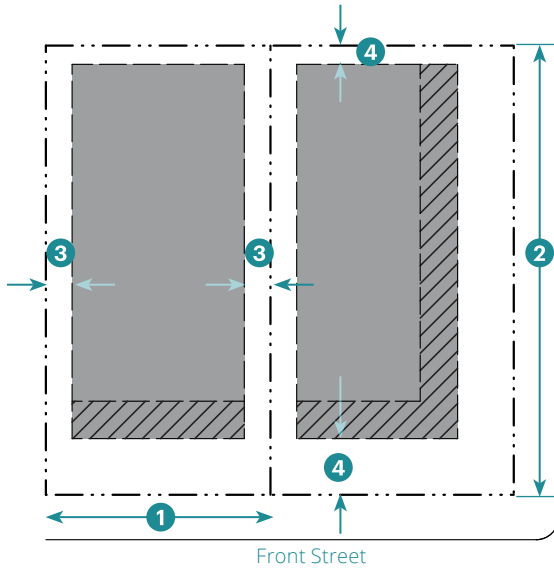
Applying the Required Amount to the Facade Zone
